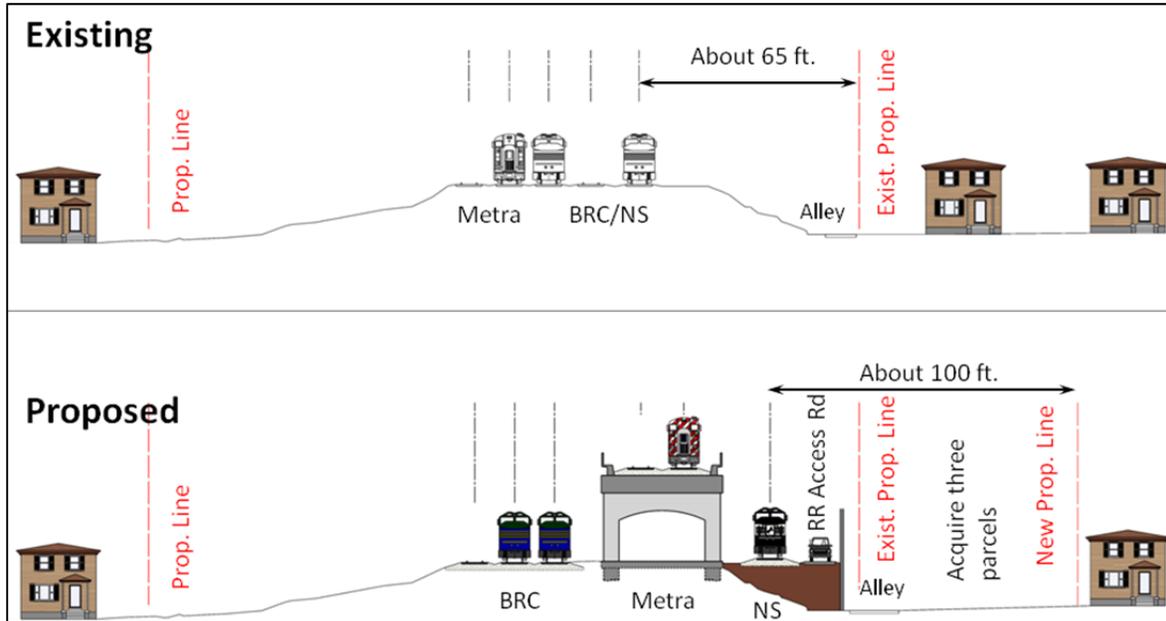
Alternates RI-1, RI-2, and RI-3 and Existing Conditions, Metra Rock Island District Connection, Looking East near Halsted Street
